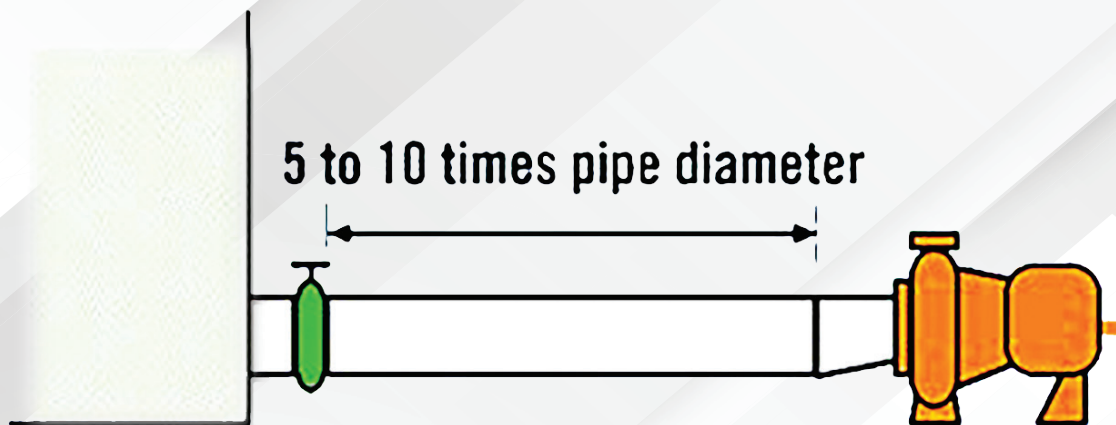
The pipe diameter on the suction side should be equal to or one size larger than the pump inlet. (Image courtesy of Crane Engineering)
